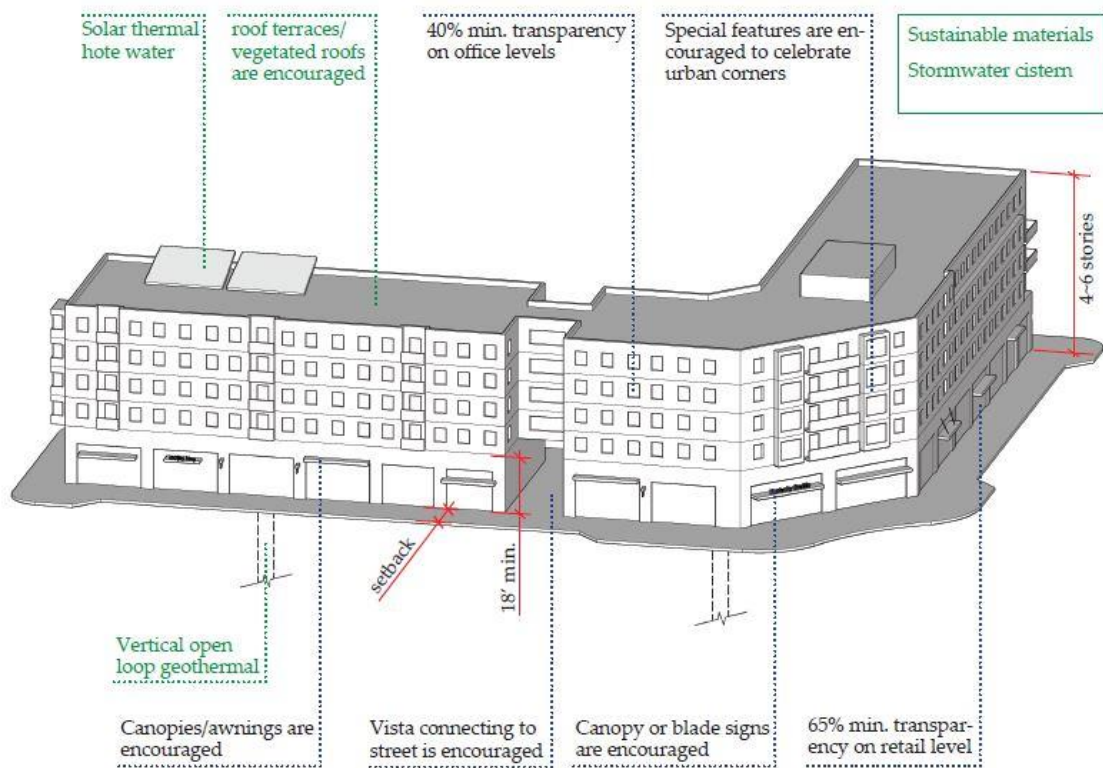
Mixed-use residential buildout example, source: (EDAW Inc., 2009)
